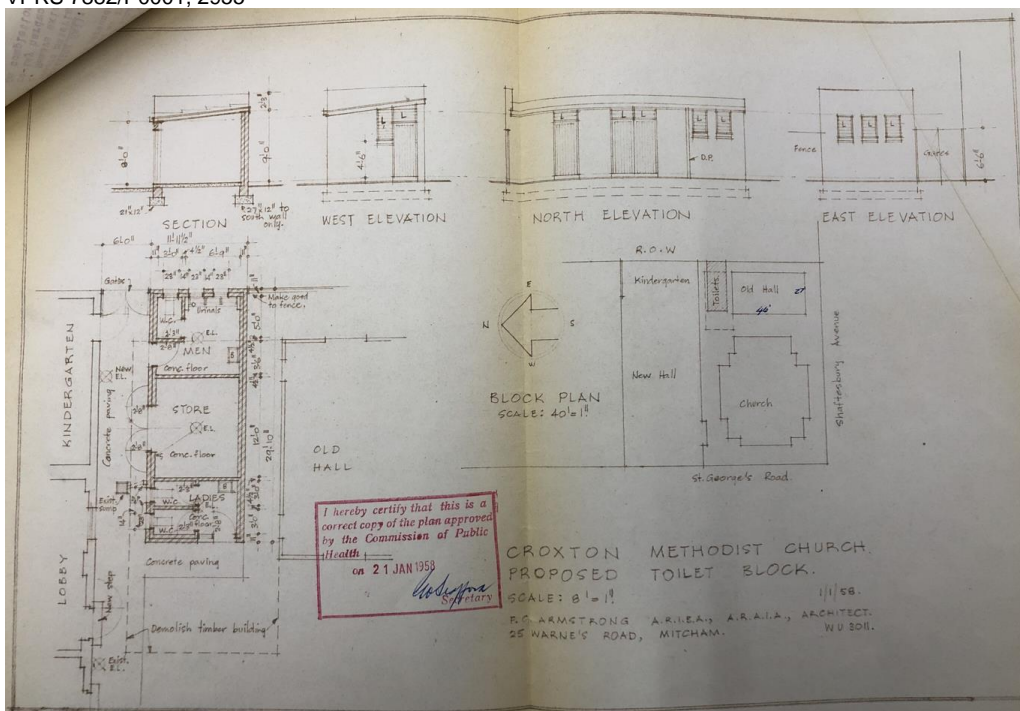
Plans for the 1958 Toilet Block. Source: Methodist Sunday School St Georges Road; Croxton, PROV, VPRS 7882/P0001, 2955
